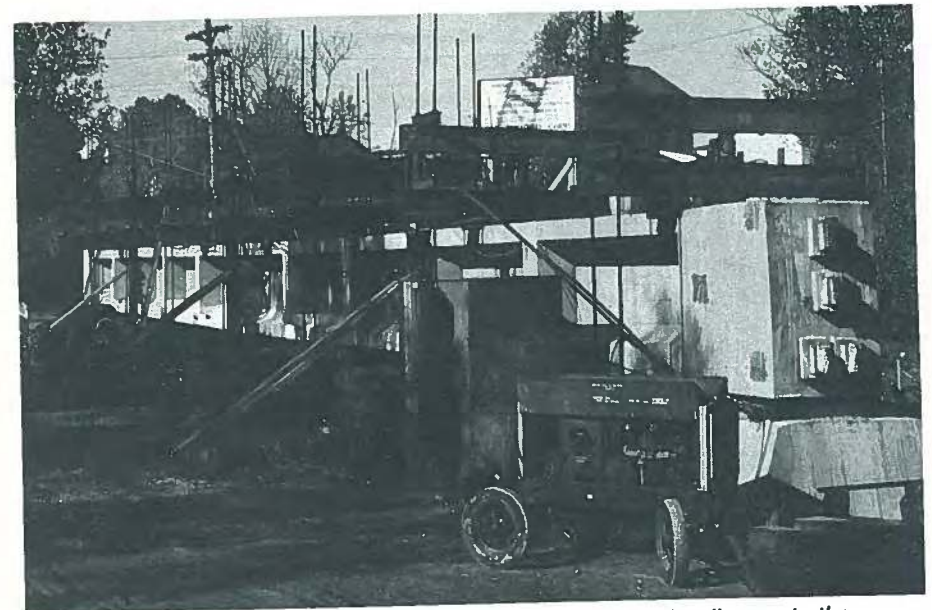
Looking northwest at Walnut Lane test girder, after loading up to the capacity of the jacks. Instrument shelter can be seen in the foreground.
